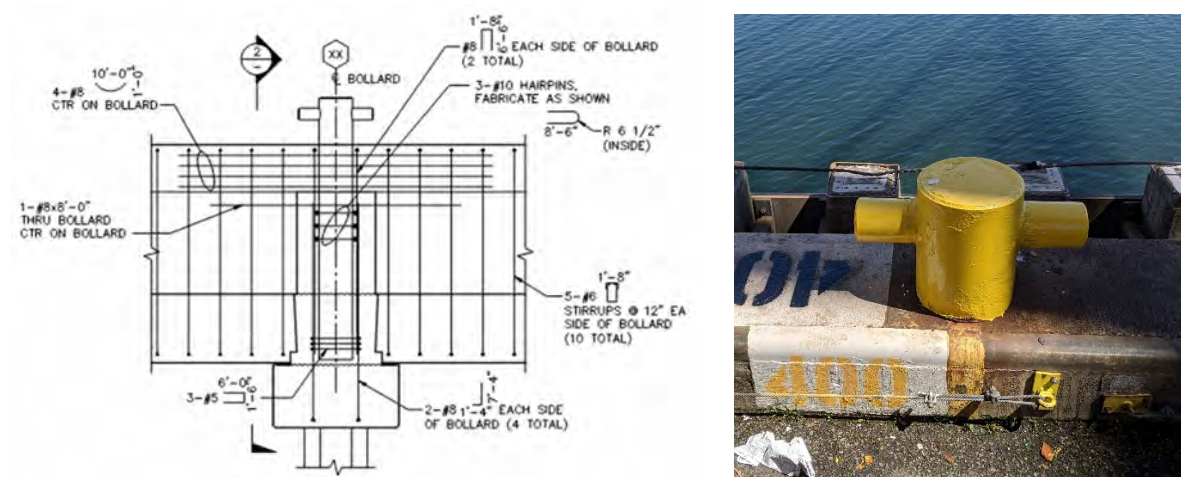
Typical Bollard Along Face of Wharf Detail and Photo
